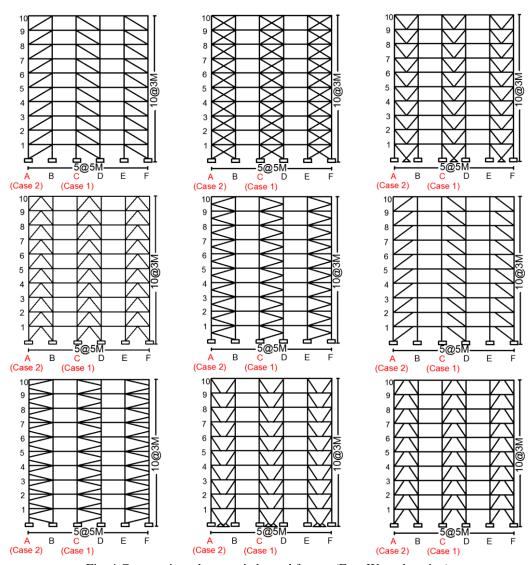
Concentric and eccentric braced frames (East-West elevation)
